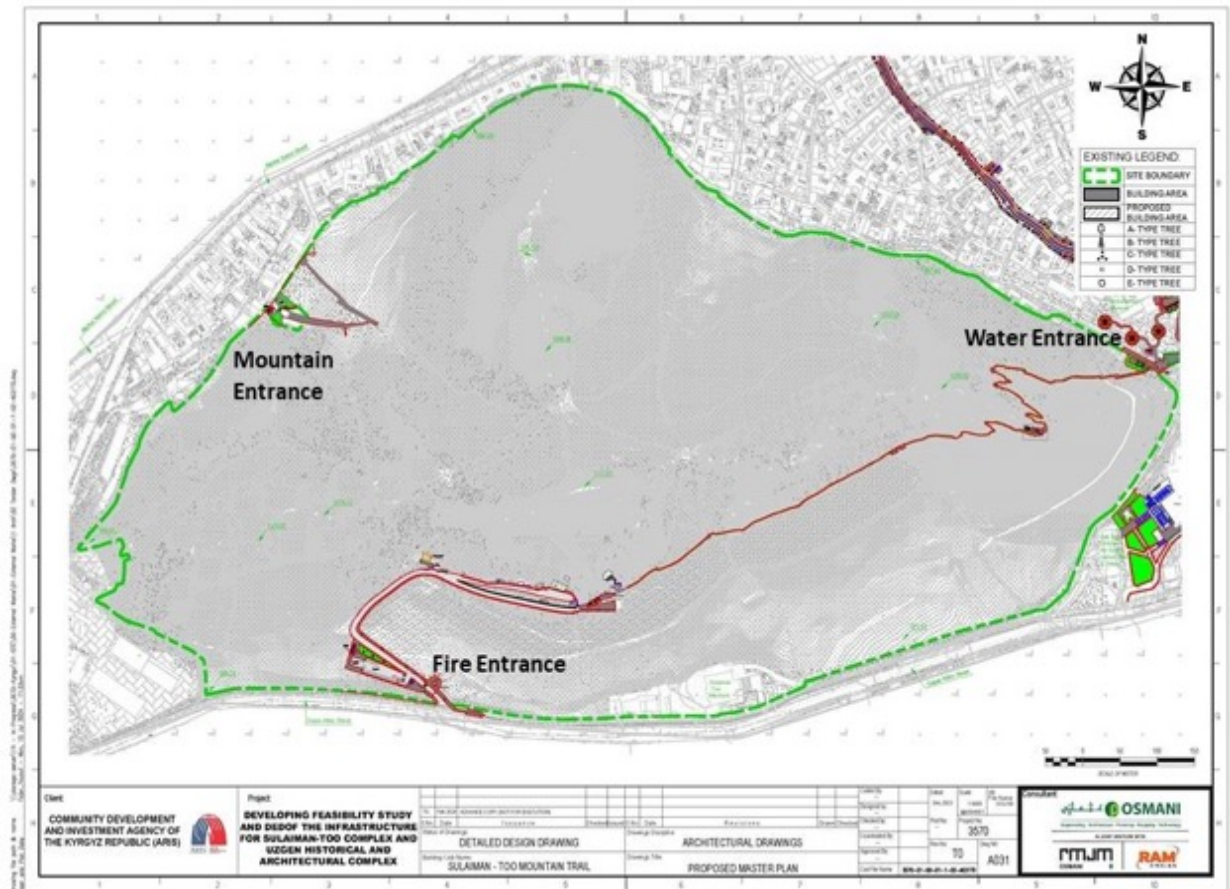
Access Infrastructure Facility: Water Gate, Fire Gate, North Access (Mountain Gate)
